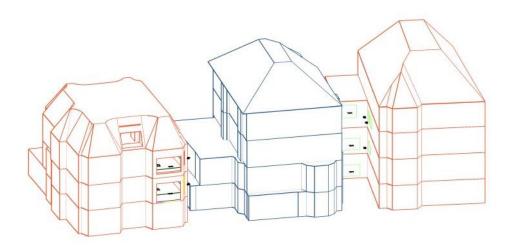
Aerial views of the proposed development with neighbouring properties - 59 Redington Road (left) and 63 Redington Road (right)
